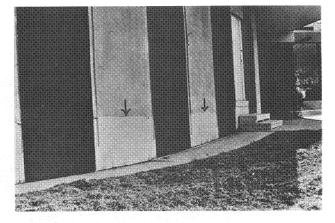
Church shown in Figure 14B showing three ft (1 m) of subsidence of ground surface on outside of building. Original ground surface marked by arrows. Note the temporary stair box below the exit. (Photo taken in April, 1980.)
